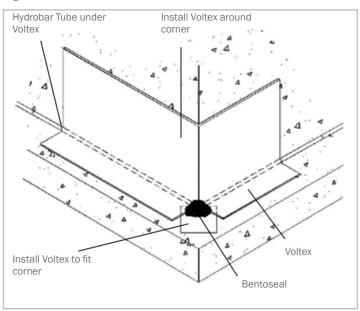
Start Voltex at the corner horizontally. Place cut section at corner and apply Bentoseal at laps.
